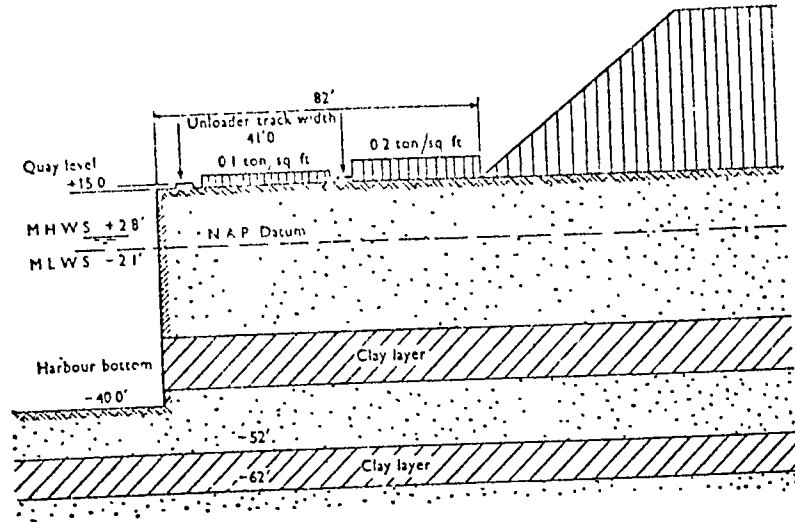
EXPECTED LOADS: ST LAWRENCE DOCK, EAST SIDE (MULLER-HANNA QUAY)
